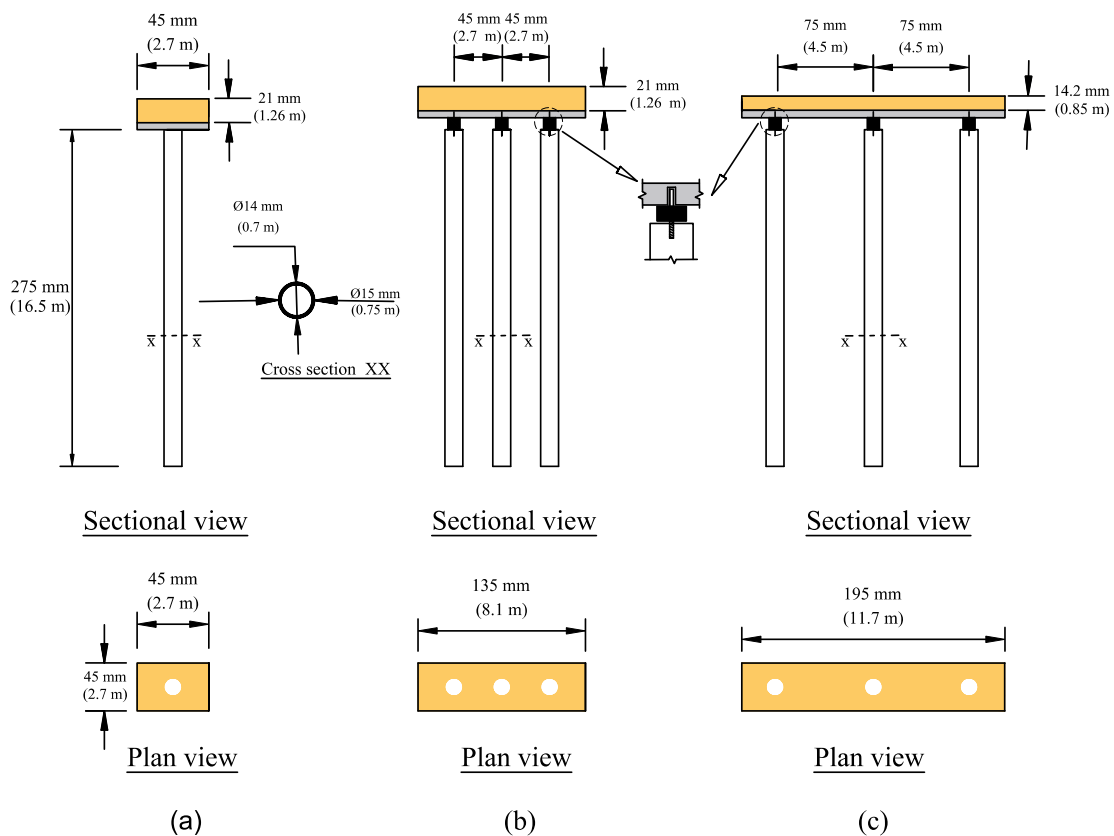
Schematic view of the pile foundations (a) S-SP (b) S-CPG and (c) S-WPG.
